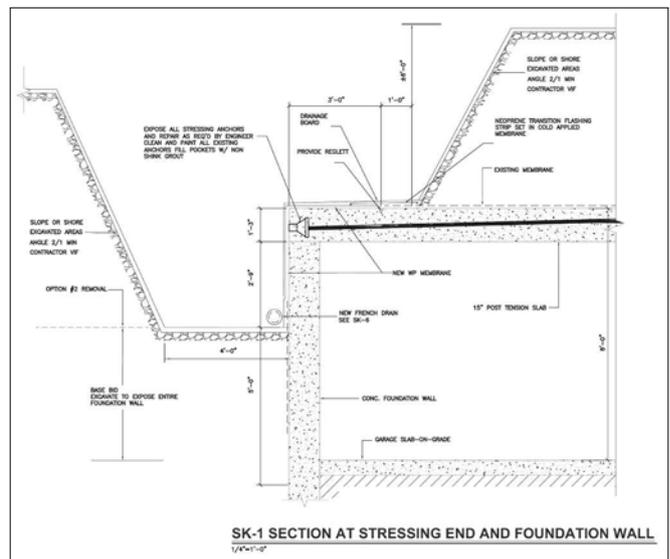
Section detail at stressing end and foundation wall (repair drawing)
